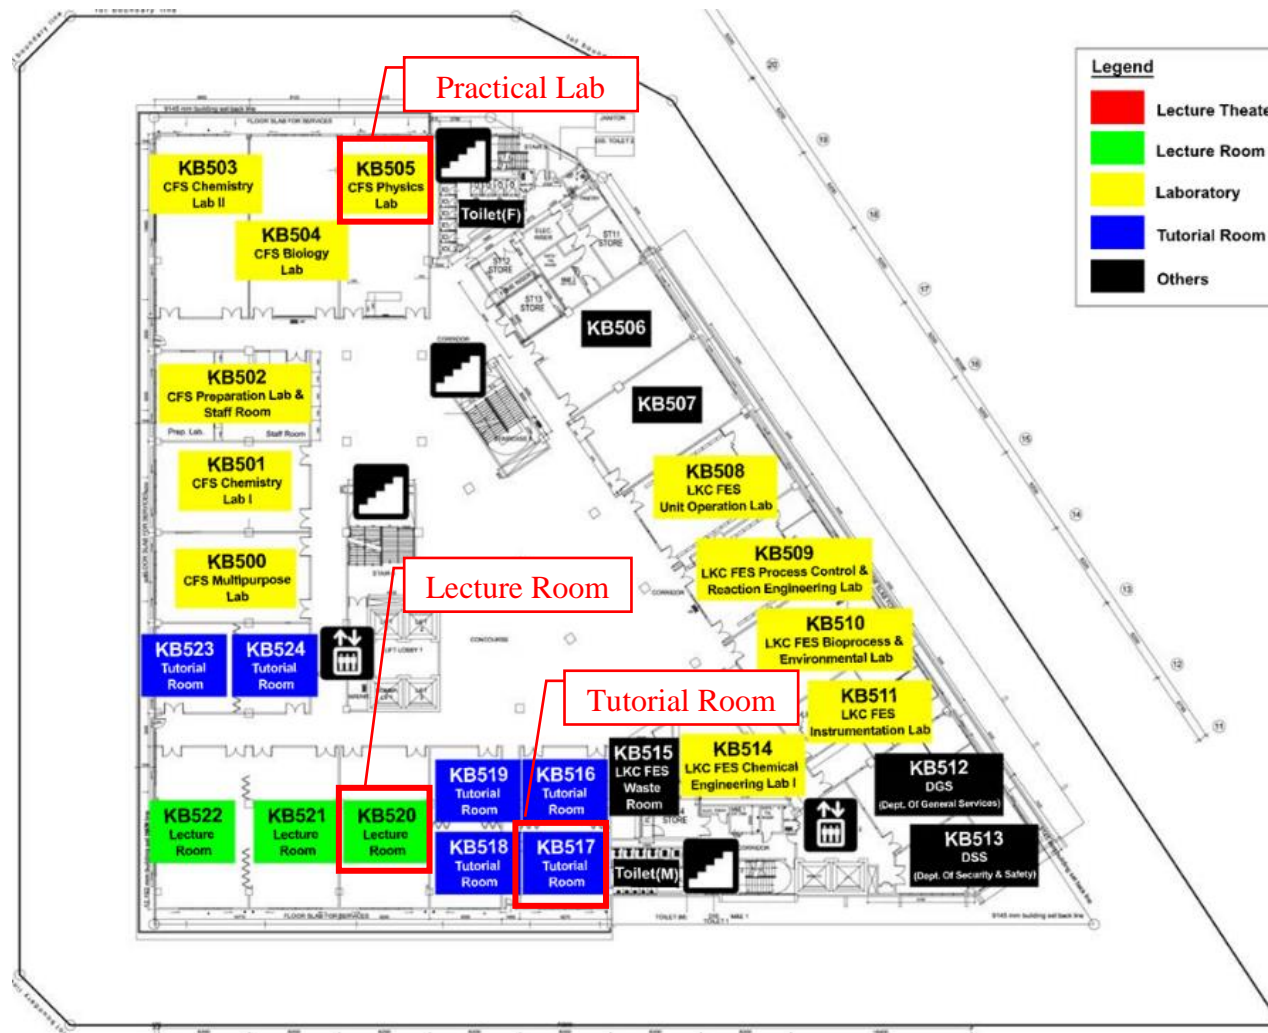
Sungai Long KB building floor plan – 5th floor.
